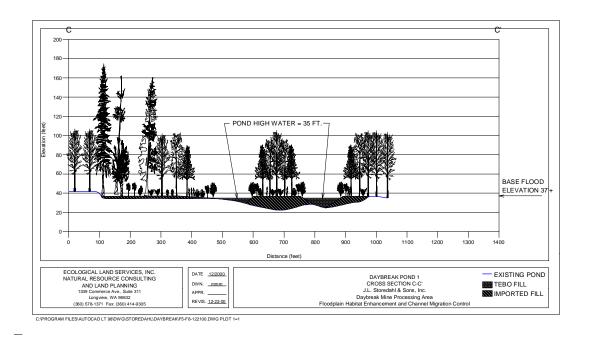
Conceptual section view of proposed fill plan for Daybreak Ponds.
